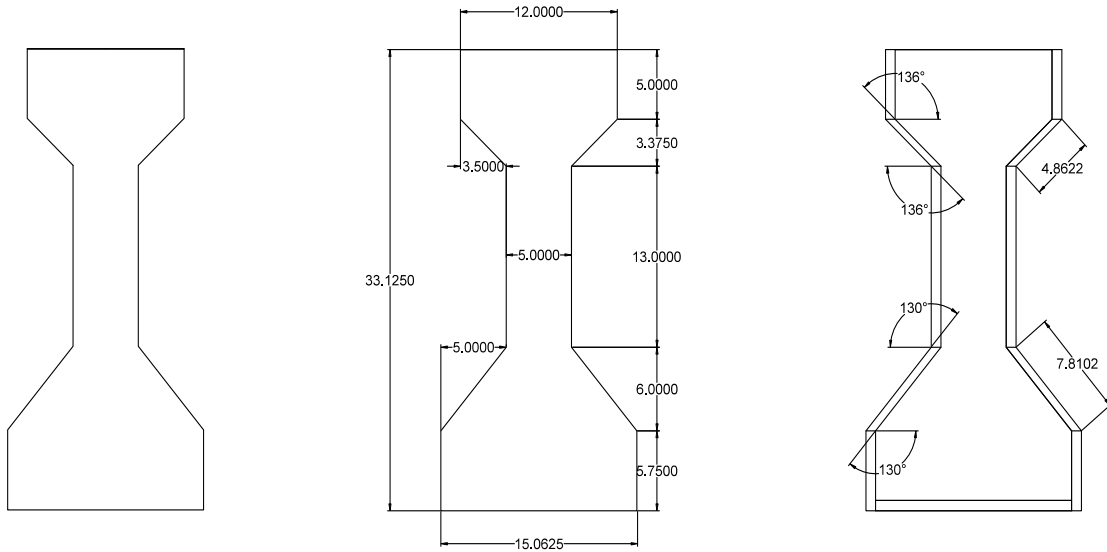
CAD drawing of mini-girders (dimensions are inches)
